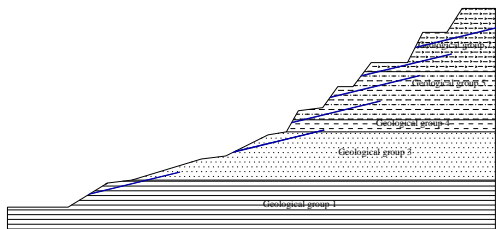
Deposition design and draining beddings arrangement for slope with height of 33m
